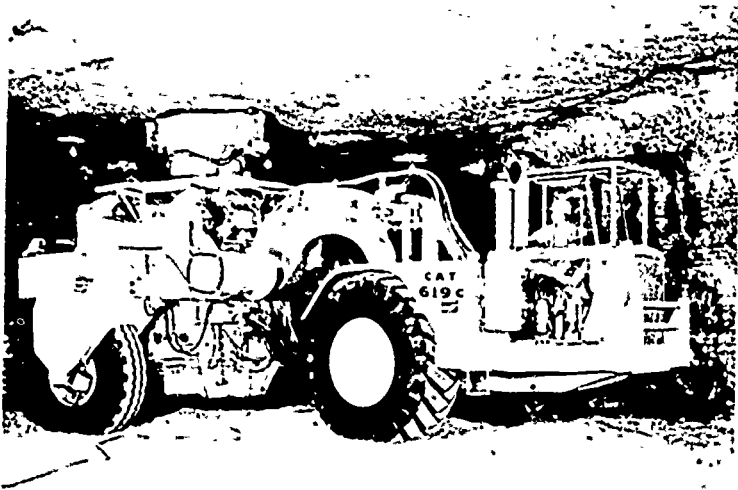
Photo B. Canisters containing radioactive material are lowered down the shaft to a specially designed trailer coupled to a conventional two-wheel tractor, which carries them to the experimental area shown in photo C. This machinery was assembled inside the mine.
